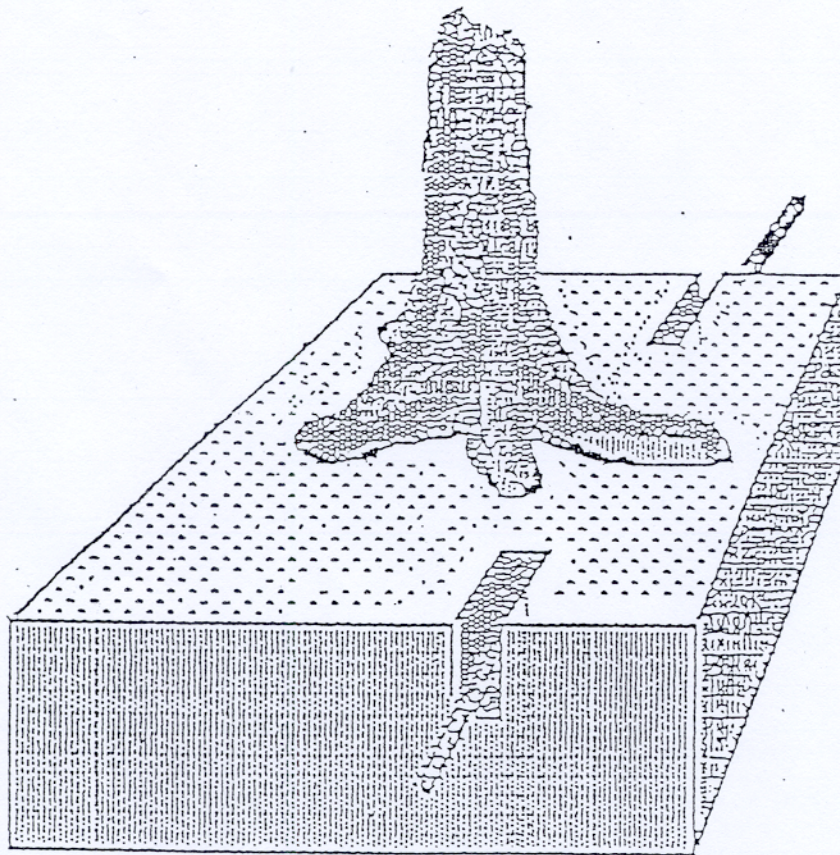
TUNNELING FOR UNDERGROUND UTILITIES
